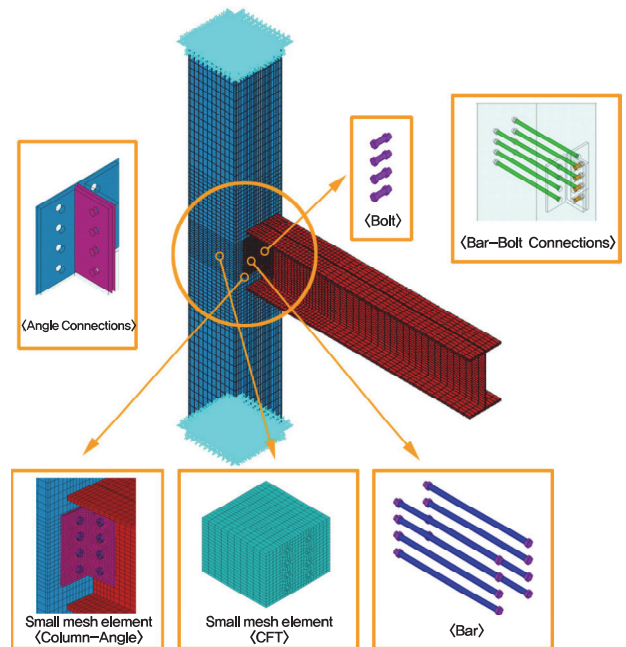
Typical finite element model of CFT column-to-beam connection with double-web angles
